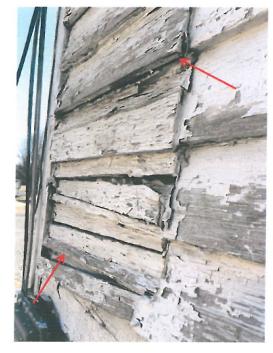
Moisture penetration and rot at wood siding, leading to delamination of siding from the wall
